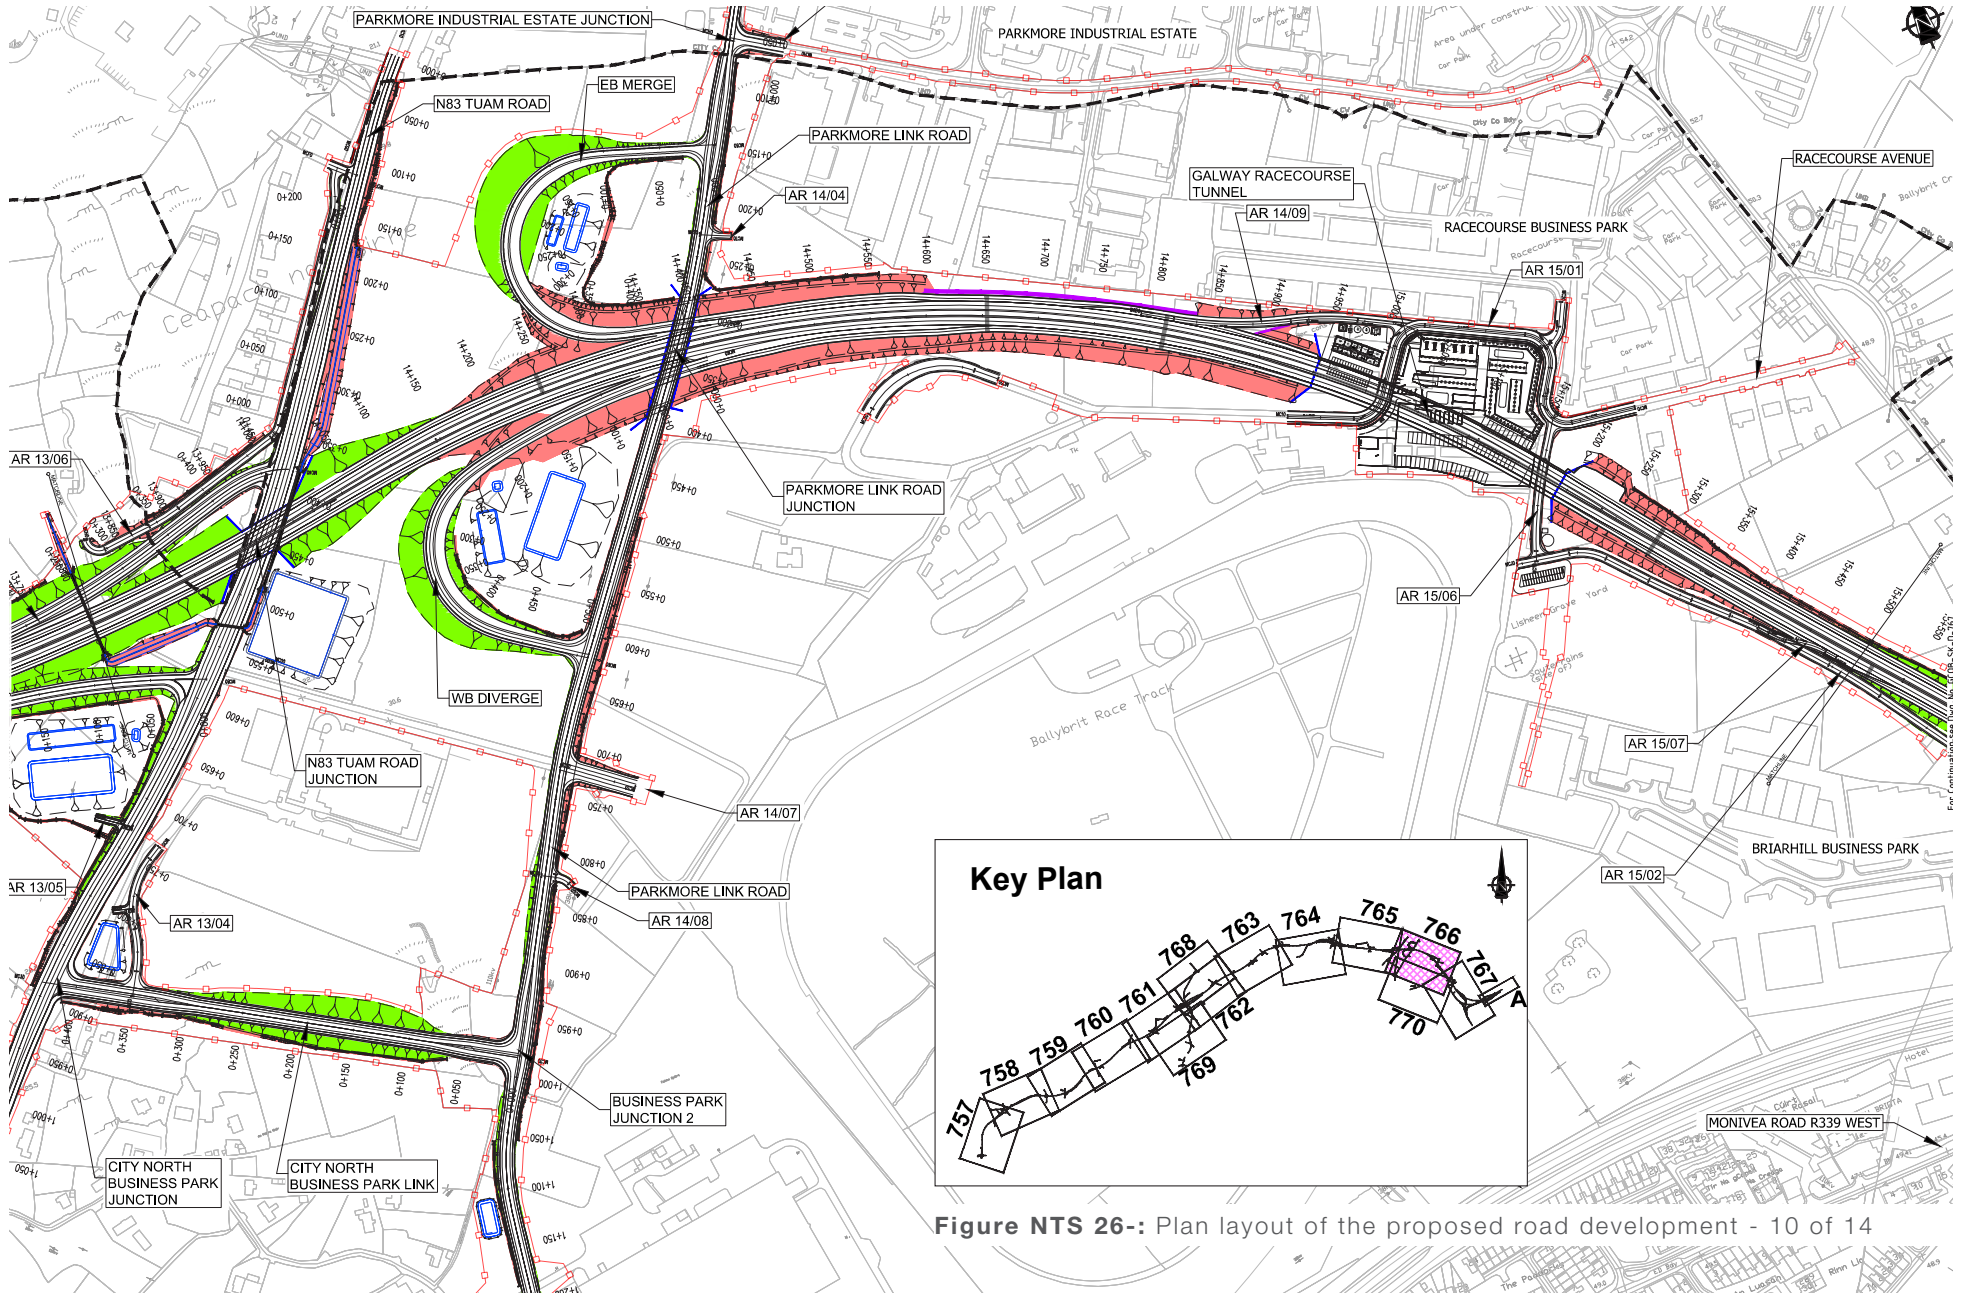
Plan layout of the proposed road development - 10 of 14
